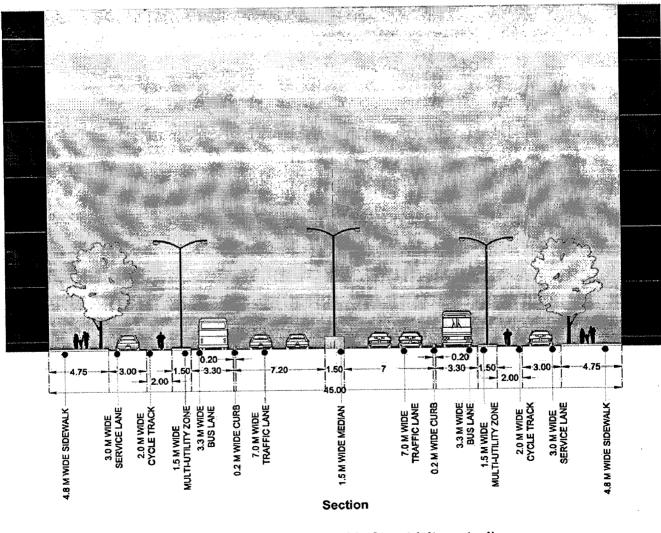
Detail for 45m wide Street (alternate 3)
